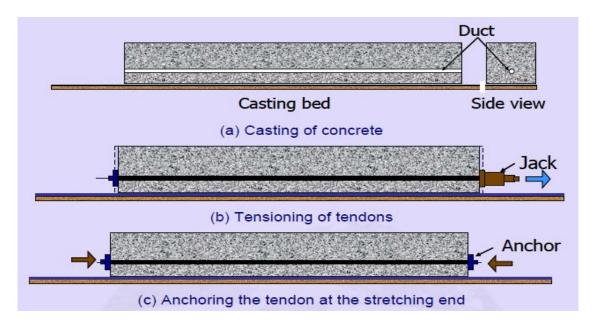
Stages of Post-Tensioning ("Referred from Prestressed Concrete Structures by Dr. AK Sengupta and Prof. Devdas Menon")
